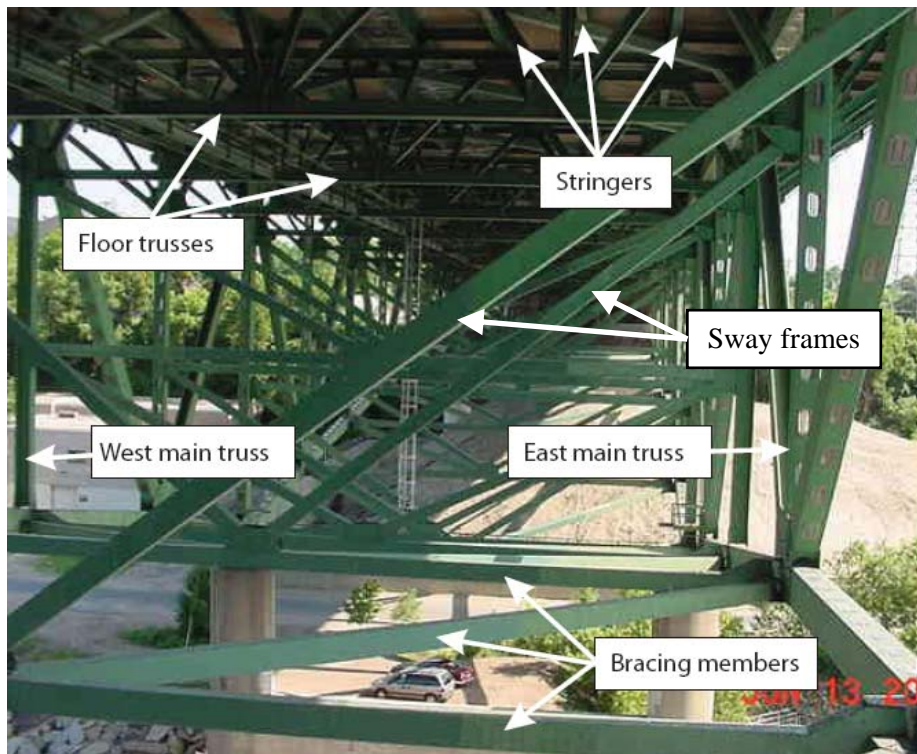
Structural system of I-35W Bridge (from NTSB 2008b).
